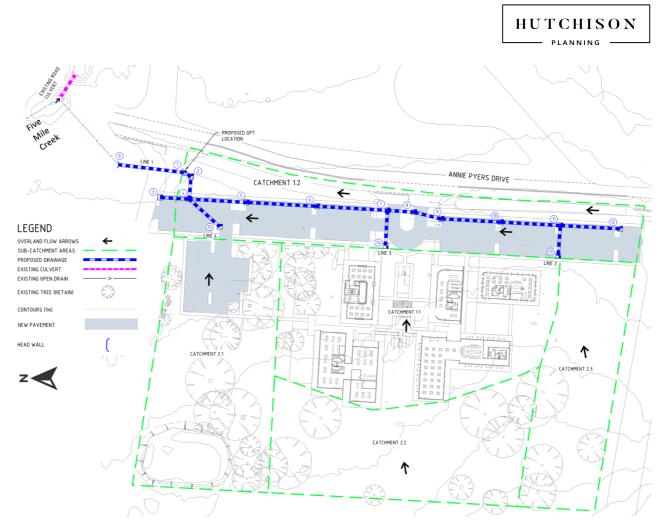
Extract from the submitted Drainage Layout And Concept Civil Plan
